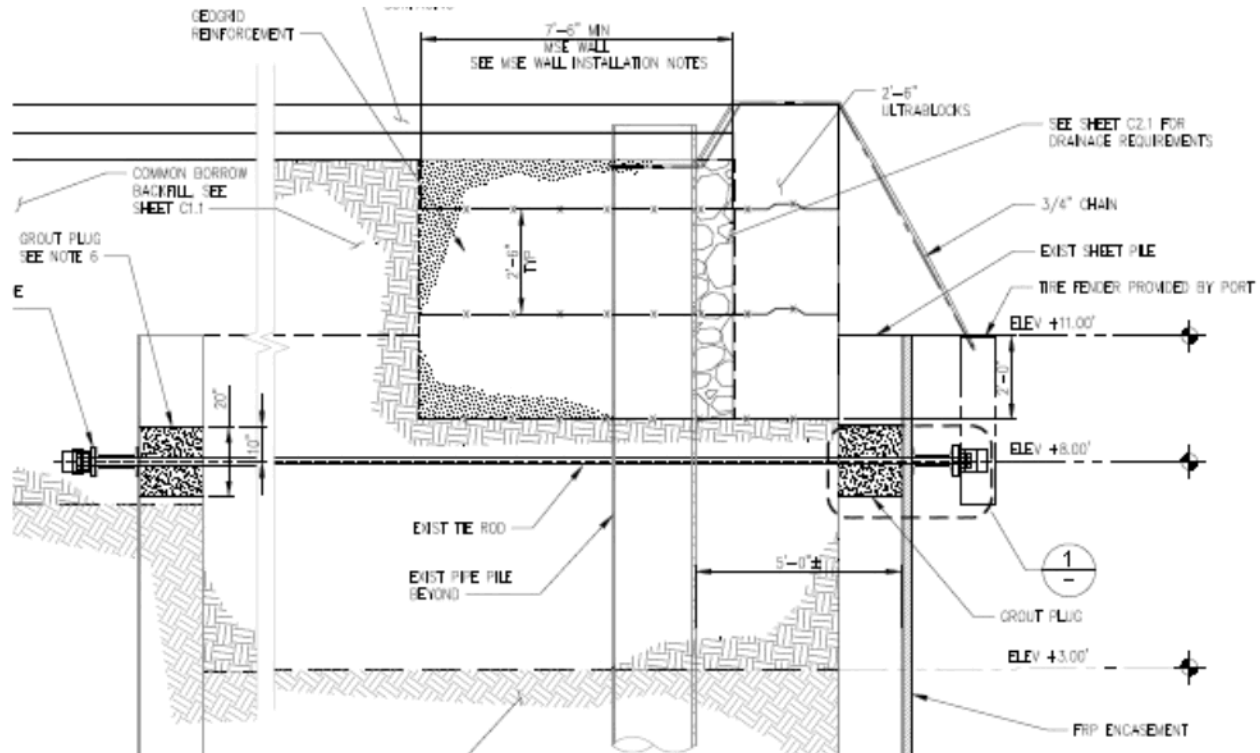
Section view of the proposed improvements to the Cofferdam Dock
